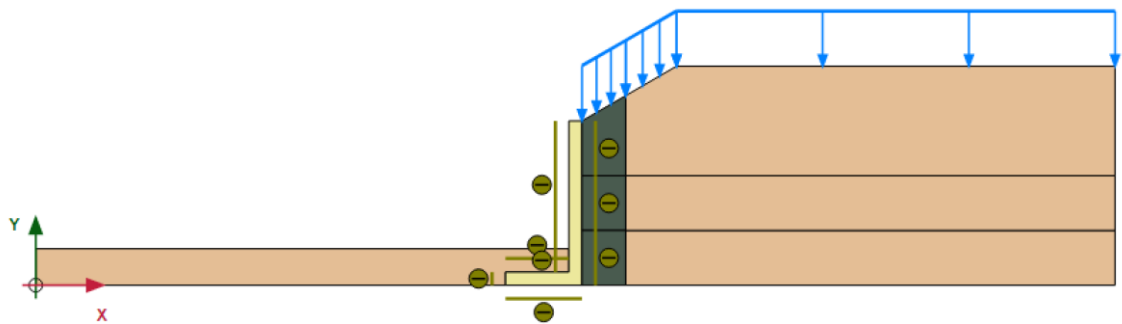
Retaining wall with backfill slope 30° and 1.2m TDA backfill
